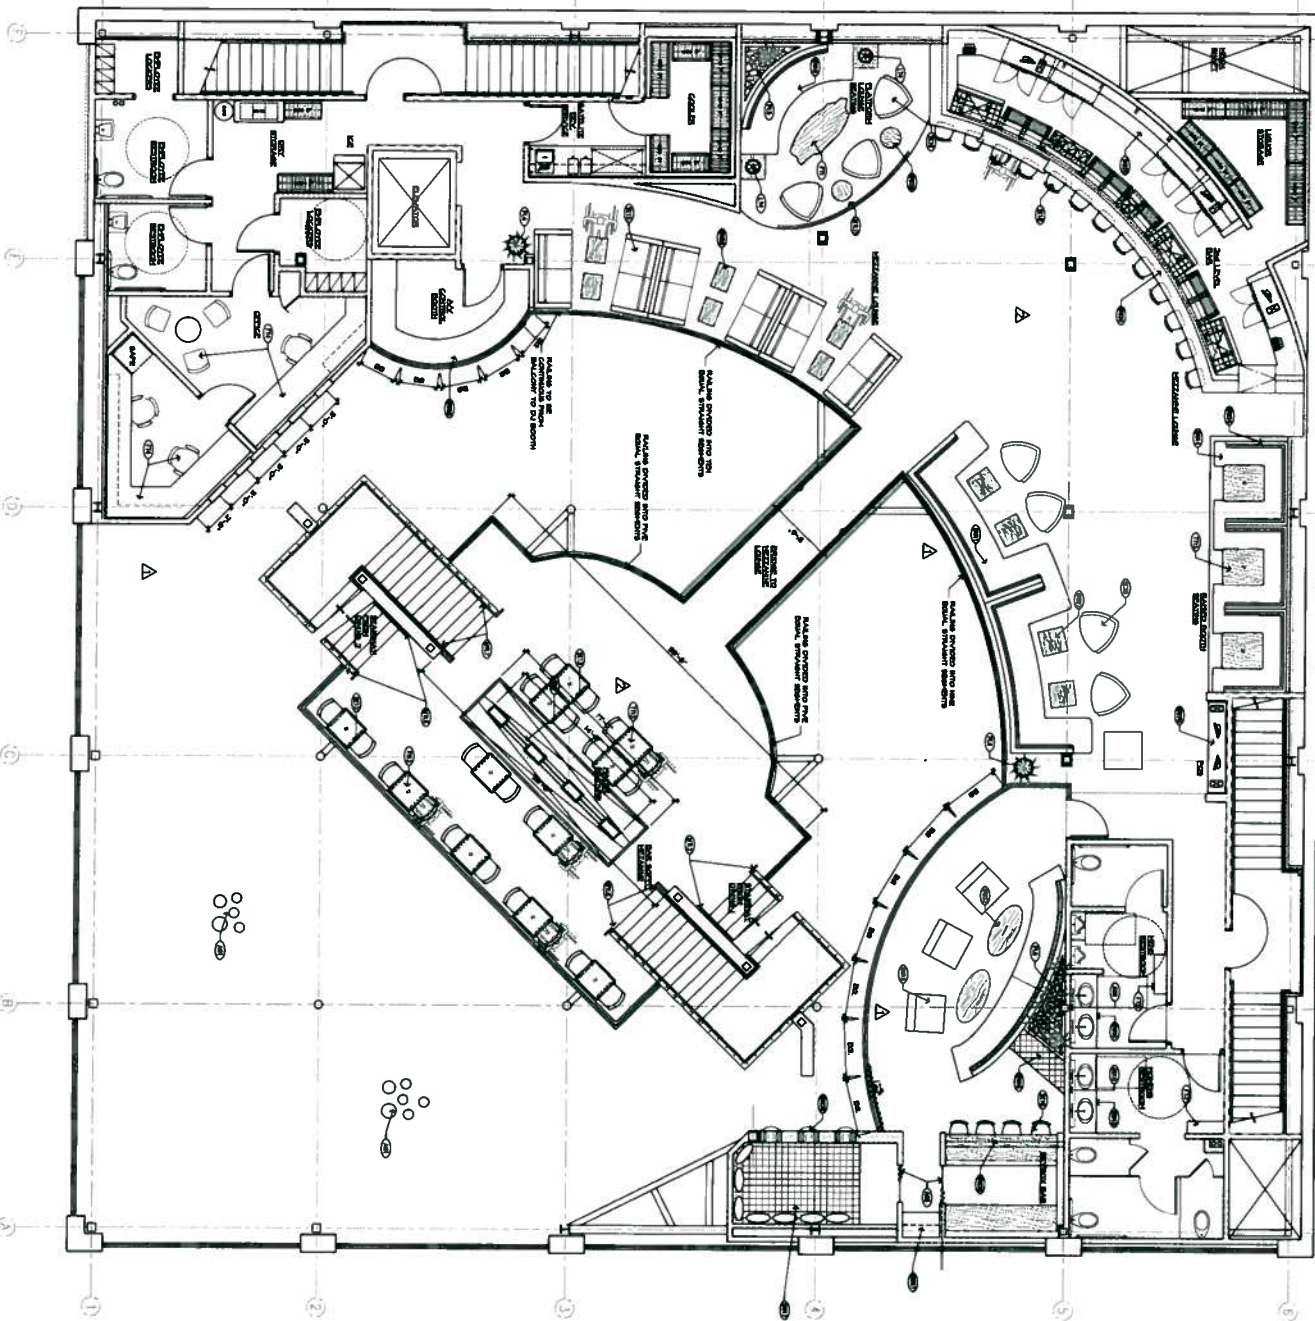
FIGURE EQUIPMENT FLOOR PLAN - MEZZANINE LEVEL
